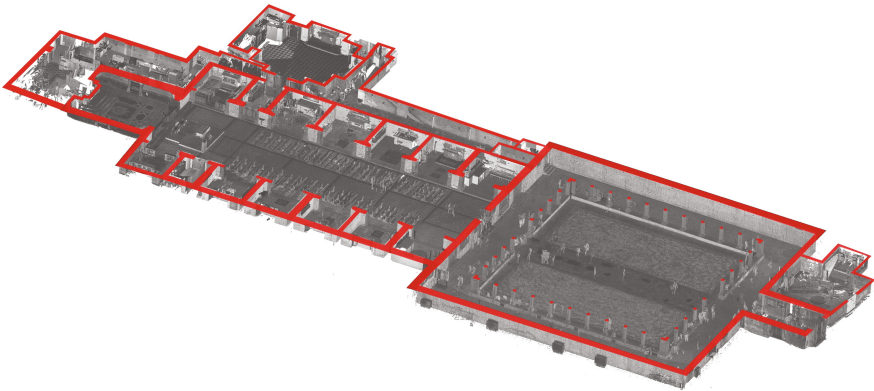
Total point cloud sectioned at 1.5 m height, used to redraw the planimetry of the complex
